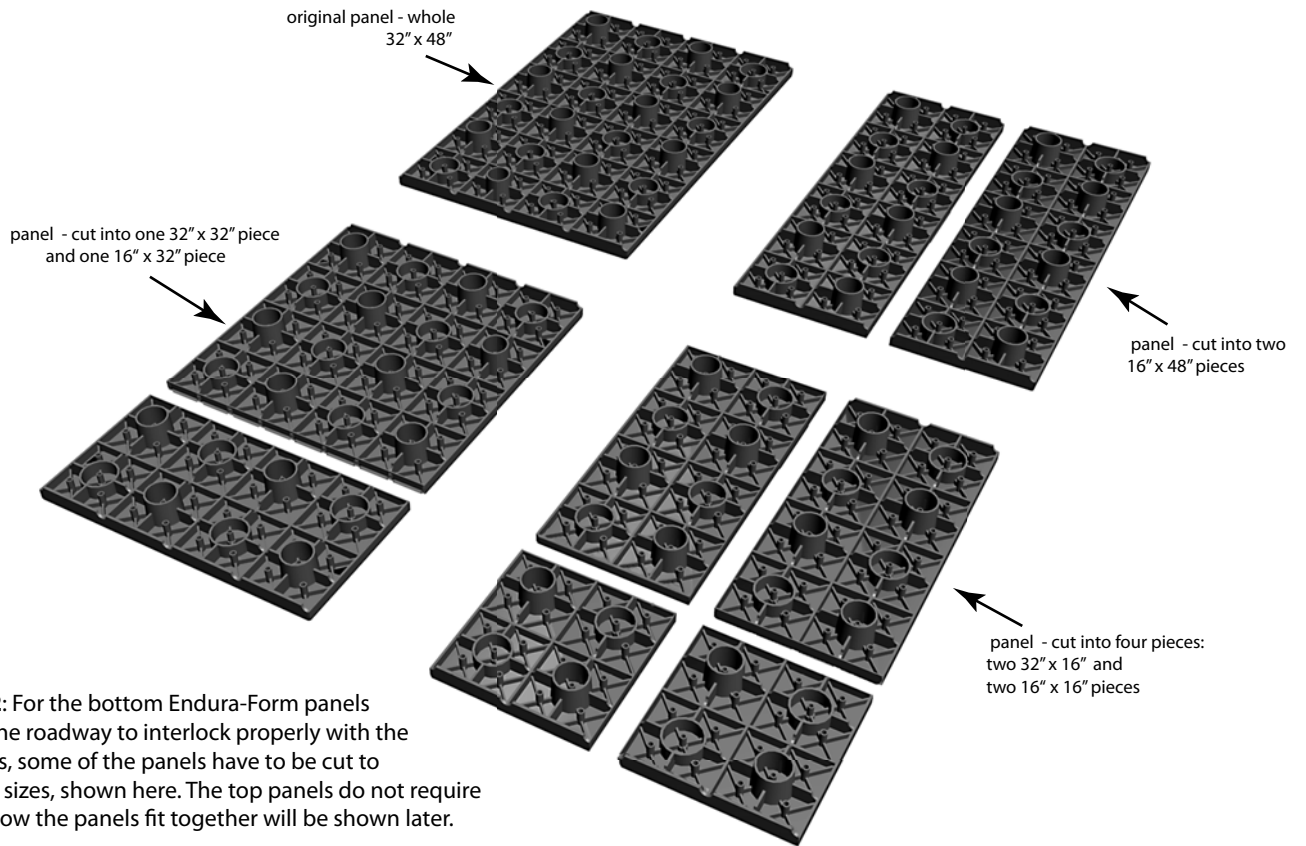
For the bottom Endura-Form panels forming the roadway to interlock properly with the top panels, some of the panels have to be cut to particular sizes, shown here. The top panels do not require cutting. How the panels fit together will be shown later.
